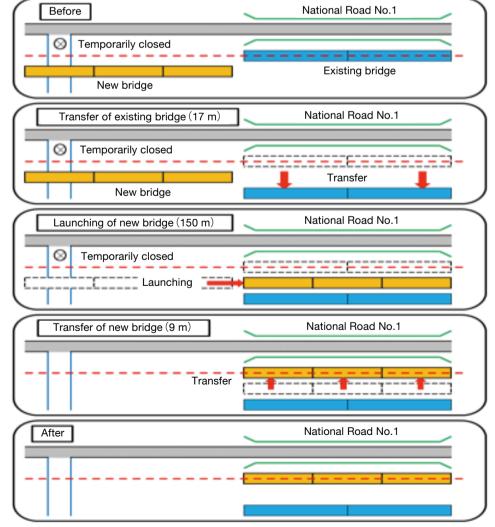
Replacement Steps Taken for No. 20 Truoi Bridge
